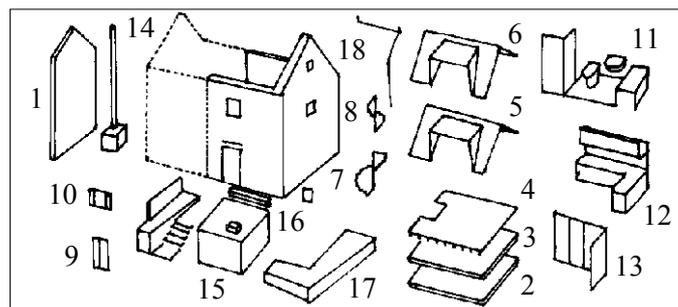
Three old walls- the rest is new: 1. western wall, 2.3.4. construction between floors, 5.6. roof, 7.8. staircases, 9.10. doors, windows, 11. bathroom, 12.13. kitchen, 14. fireplace, 15. septic tank, 16. stone bench, 17. terrace, mini garden, 18. thunder protection, etc, etc.
